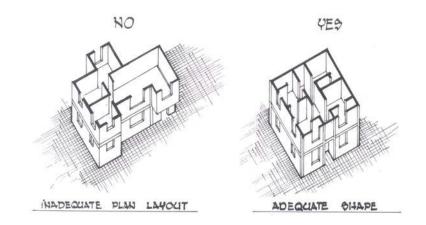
Irregular and regular wall arrangement (Brzev, 2007)
